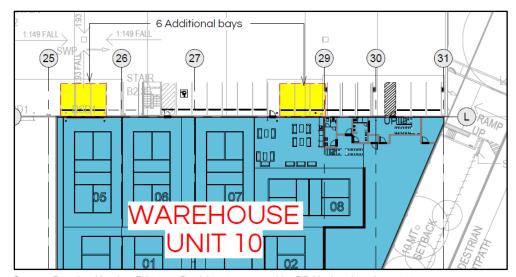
Proposed addition spaces adjacent to Warehouse Unit 10
